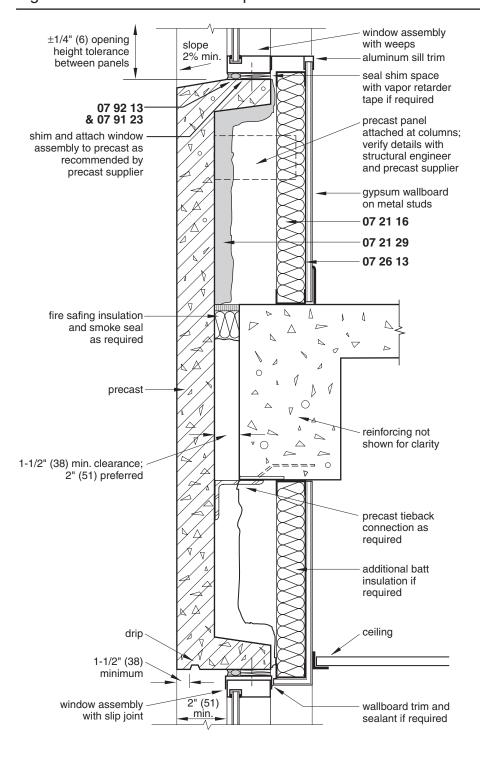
Precast concrete spandrel with insulation 03 40 01
